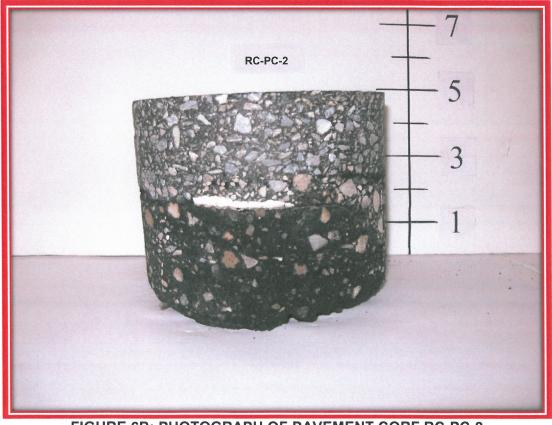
B: PHOTOGRAPH OF PAVEMENT CORE RC-PC-2
